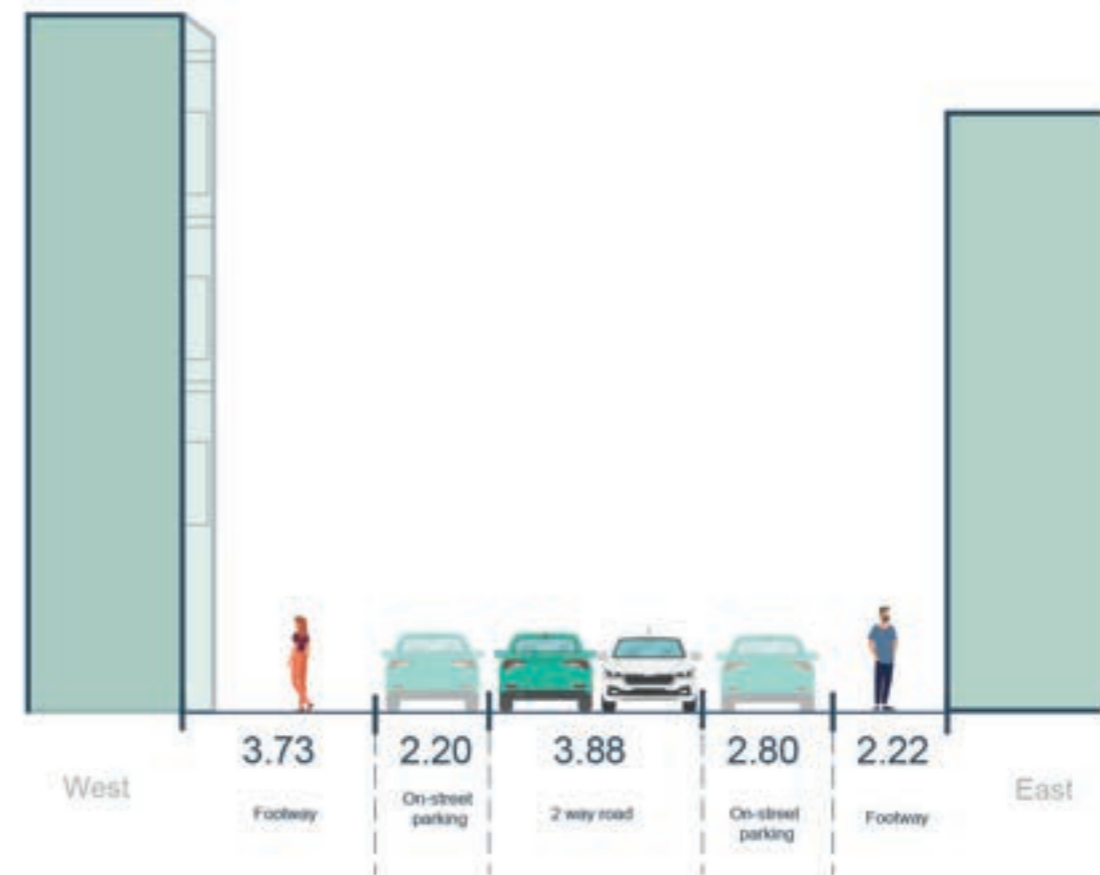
Existing street section of Charlotte between John Street and Maberley Street
